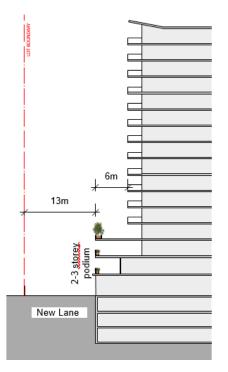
Setbacks to New Lane connecting Carlingford Road and Rawson Street
